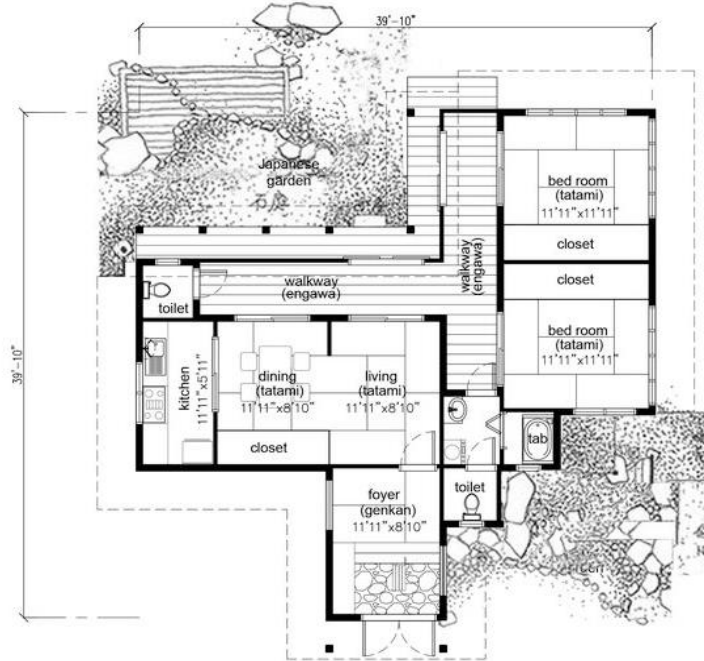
Plan of a traditional Japanese house using the kyo-ma method
